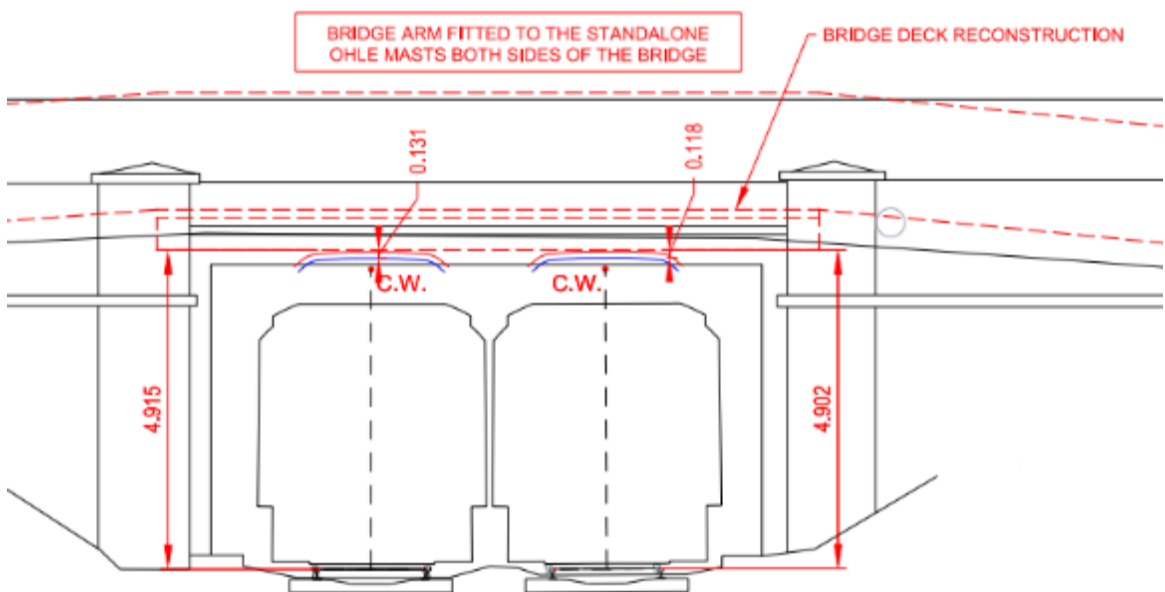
Example Cross Section for Fitted at Each Side of Glasnevin Cemetery Road Bridge (OBO10)
